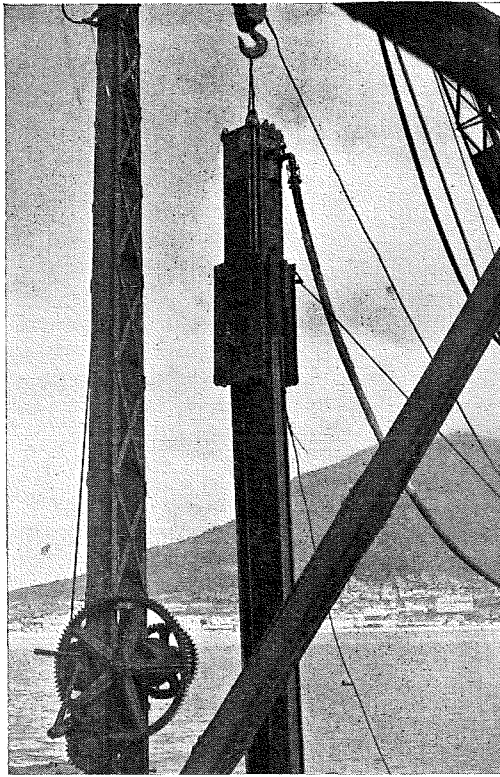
DOUBLE-ACTING STEAM HAMMER DRIVING STEEL SHEET PILES.
